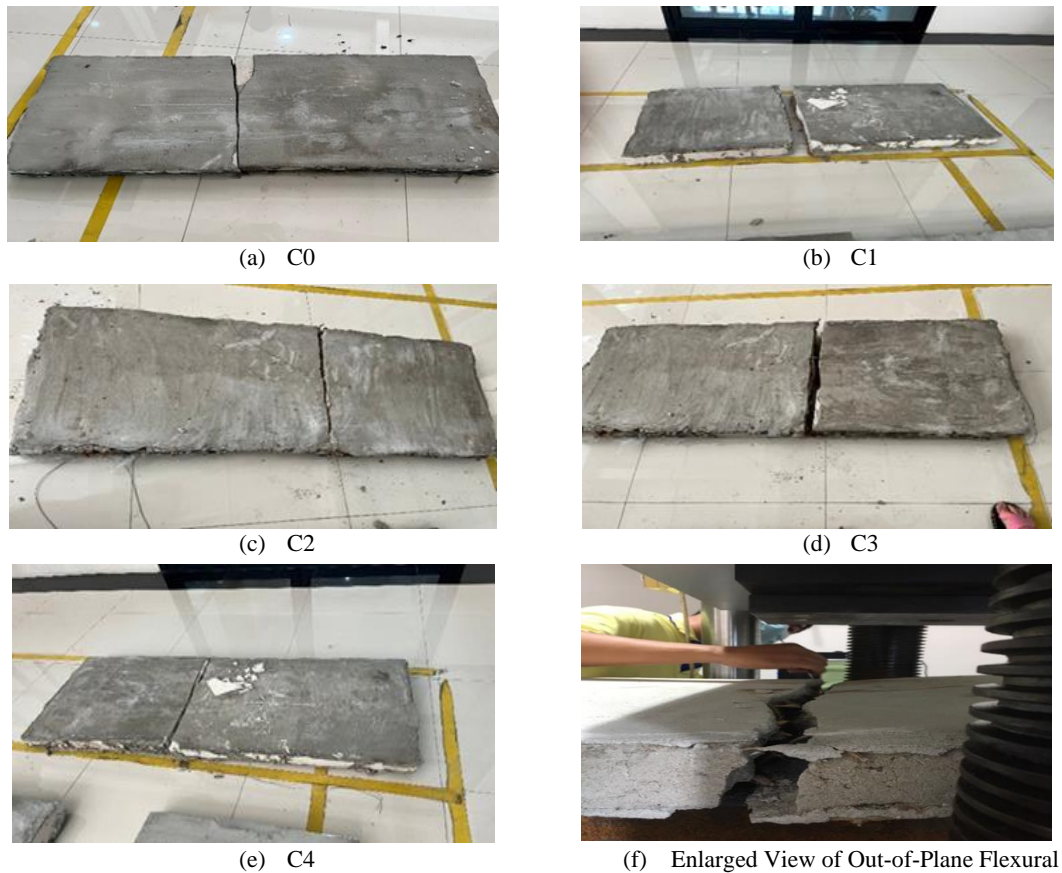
Cracks in a brick and block wall reinforced with coconut rope netting
